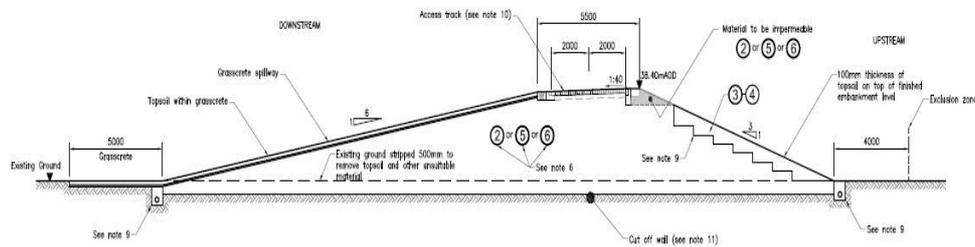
Typical section of the spillway showing upstream shoulder protection as benched profile
